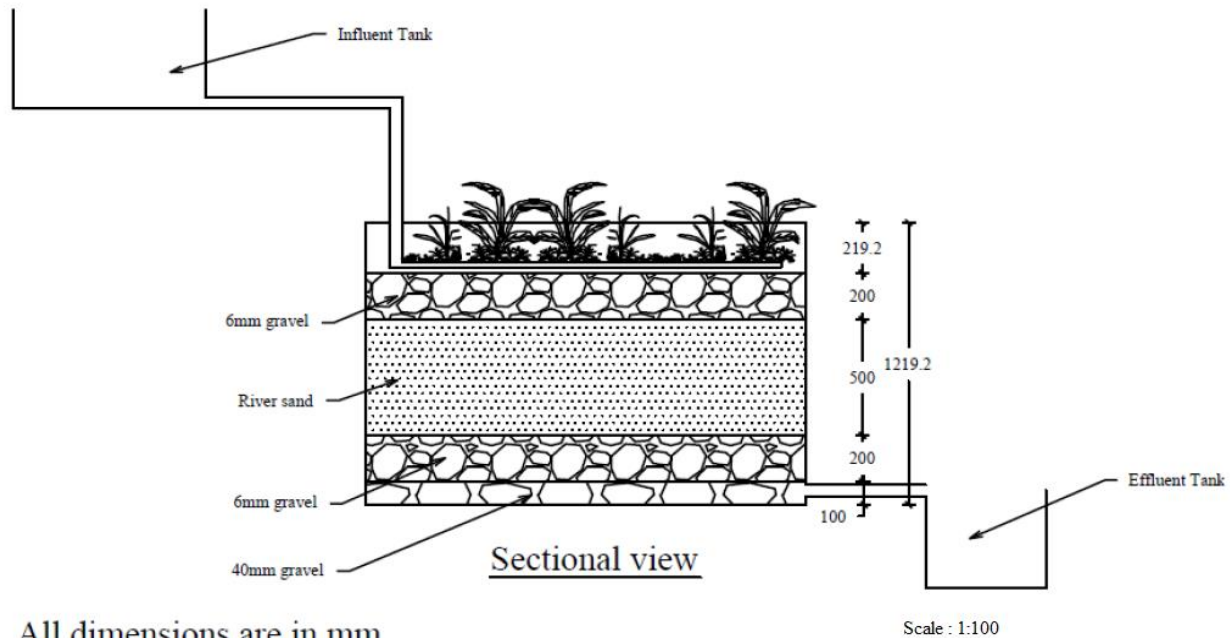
Cross-sectional view of a typical constructed wetland unit.
